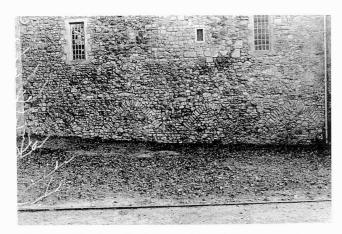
North wall of Garage/Coach house showing relieving arches and later inserted windows, 1997
